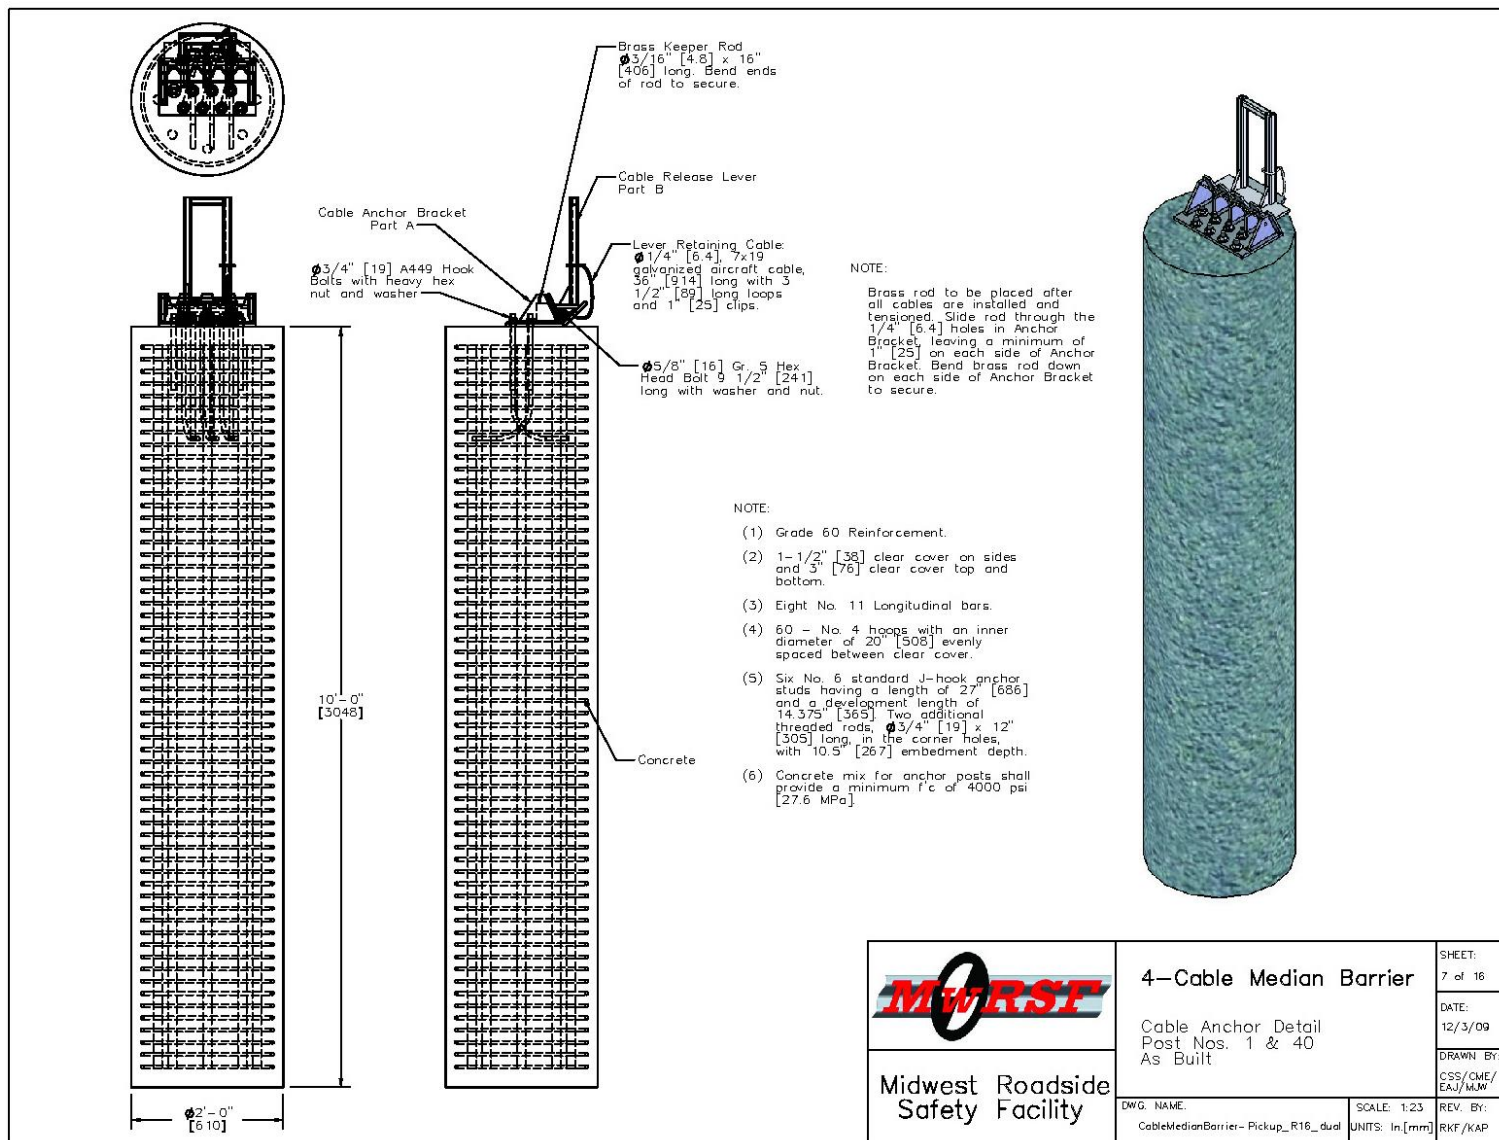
Cable Anchor Construction Details, Test No. 4CMB-1, 2007 [66]
